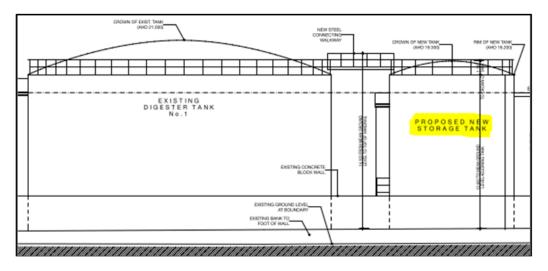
Northern side elevation of the proposed new biomass storage tank highlighted in yellow (Source: extracted from the submitted plans).
